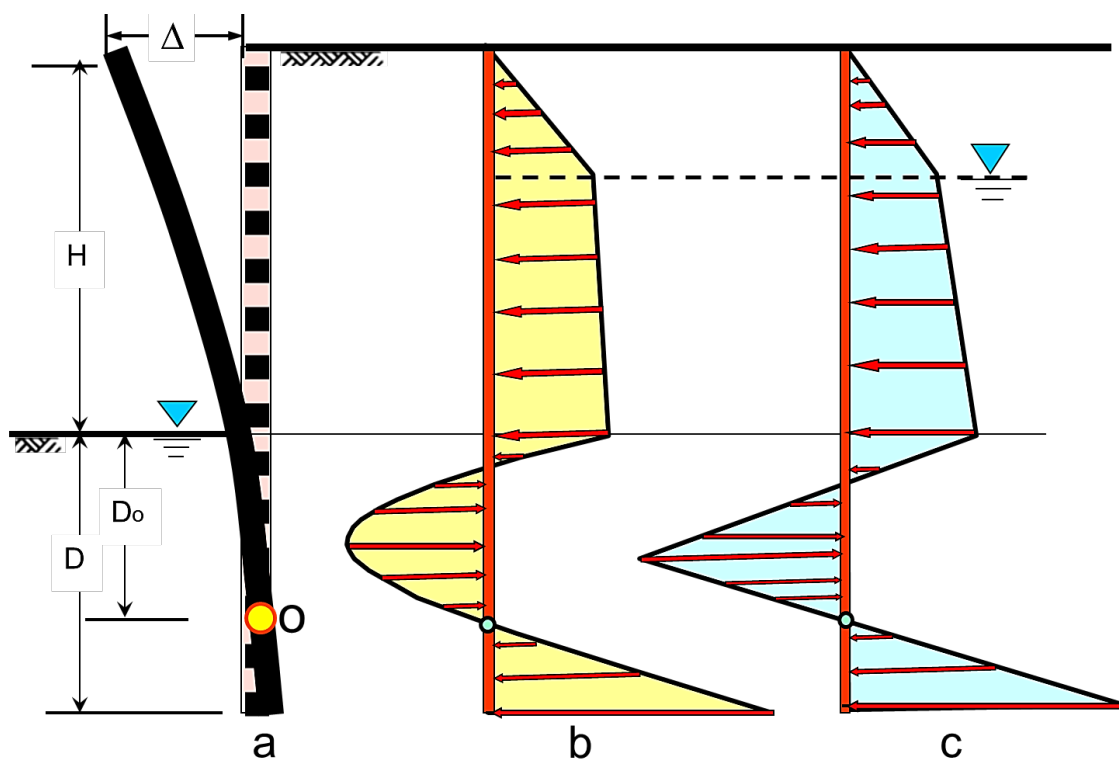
Cantilever Sheet Pile Walls Idealized Loading Diagram
